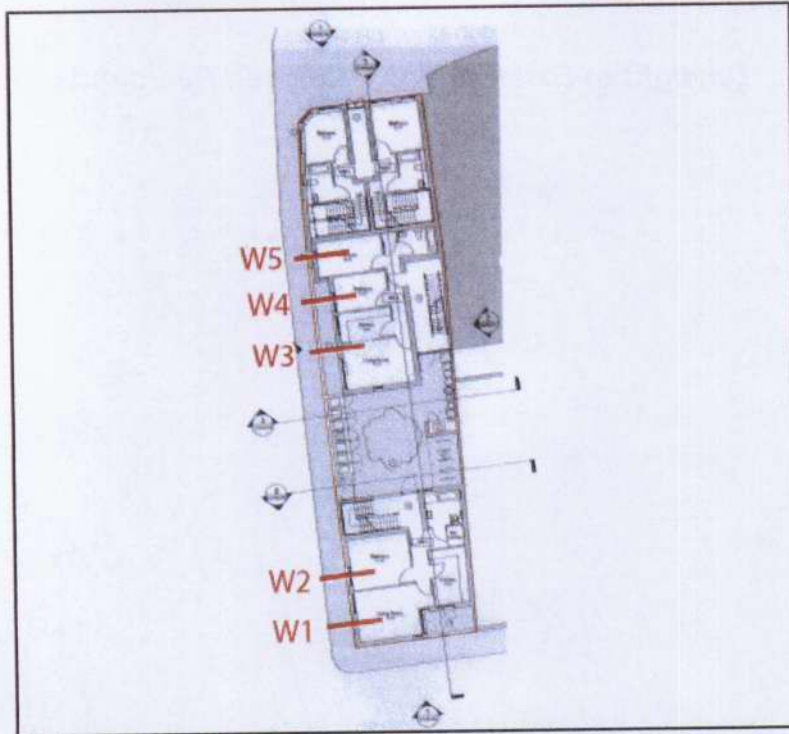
Window location plan for sunlight/daylight assessments to proposed buildings.
